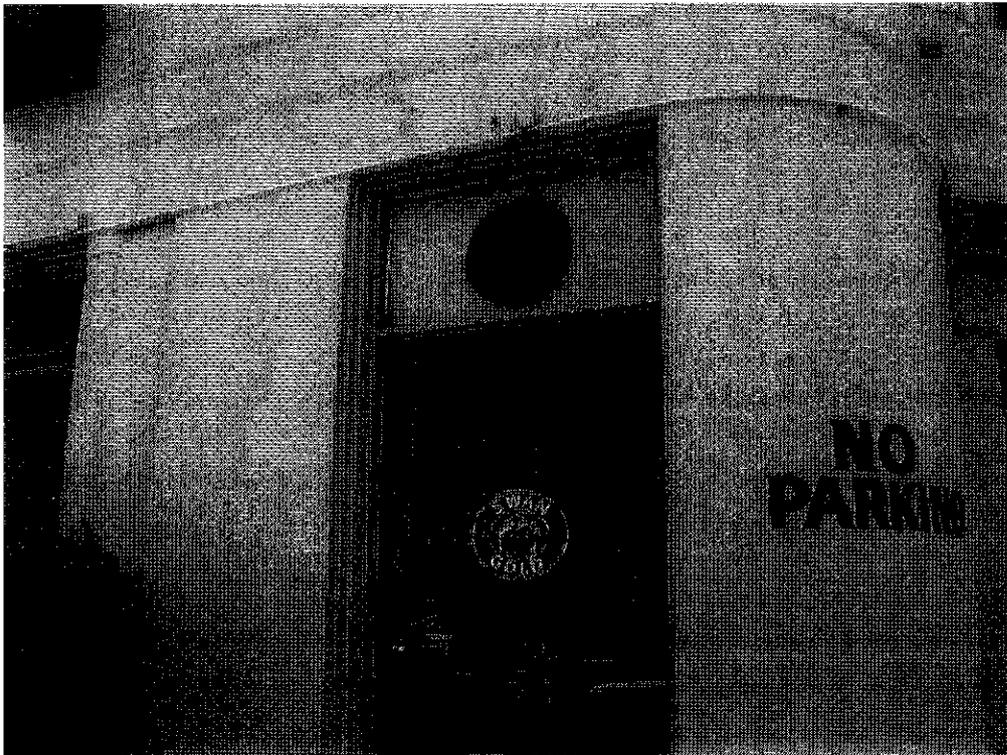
Stepped opening on southern façade filled with aluminium glazing. Hocking Planning & Architecture (WDW). February 2003.
